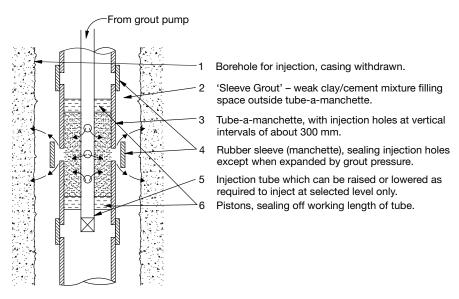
General arrangement of a tube-a-manchette (after Megaw and Barlett 1982, used with permission from John Bartlett)
